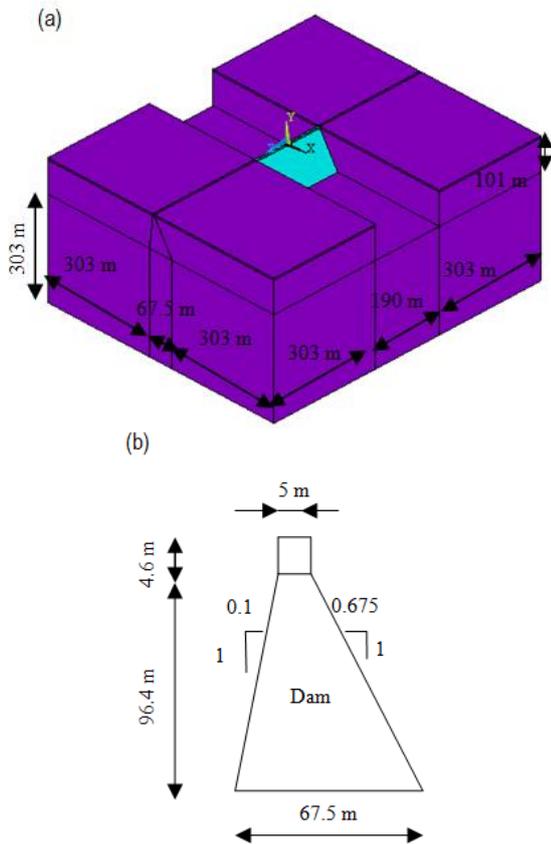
Geometry of Oued Fodda dam-foundation rock system: (a) dam-foundation rock system; and (b) dam body
